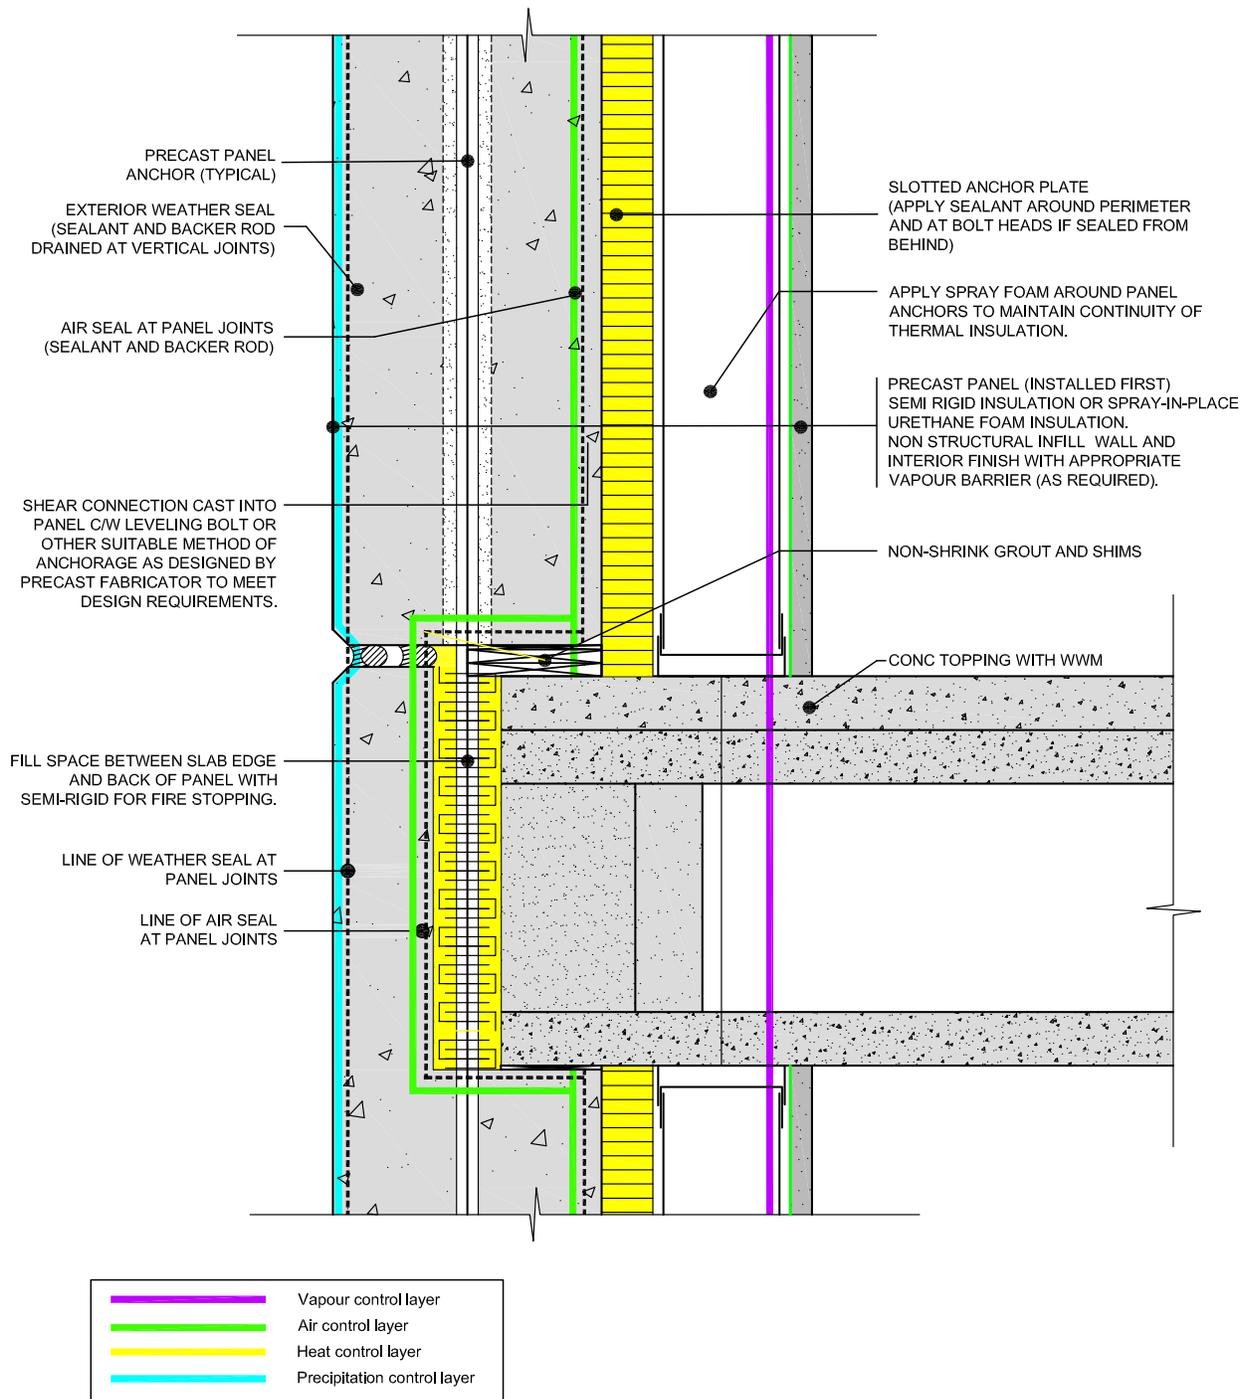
Single wythe precast panel—lateral foundation wall connection.
